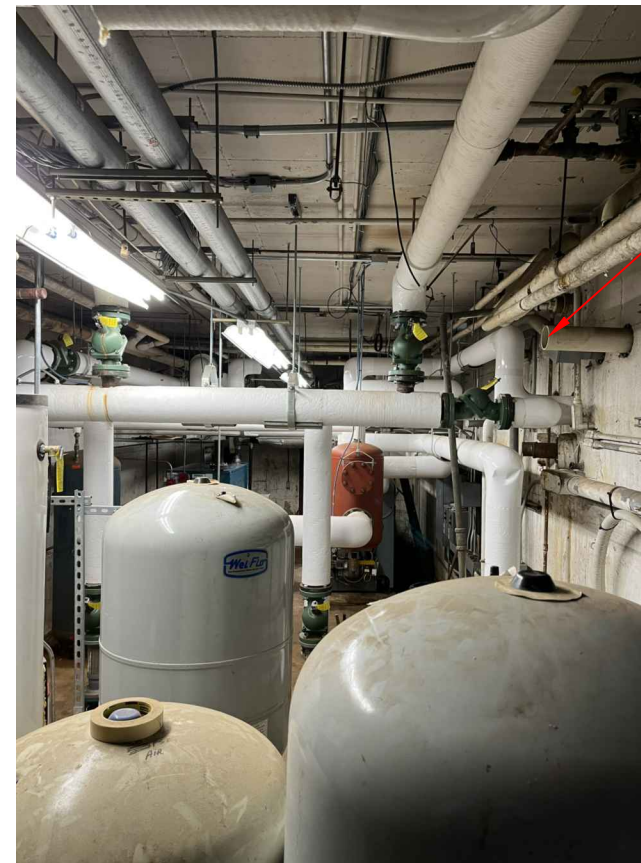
PHOTO LOOKING SOUTH AT WEST WALL OF KES #1 BOILER ROOM
